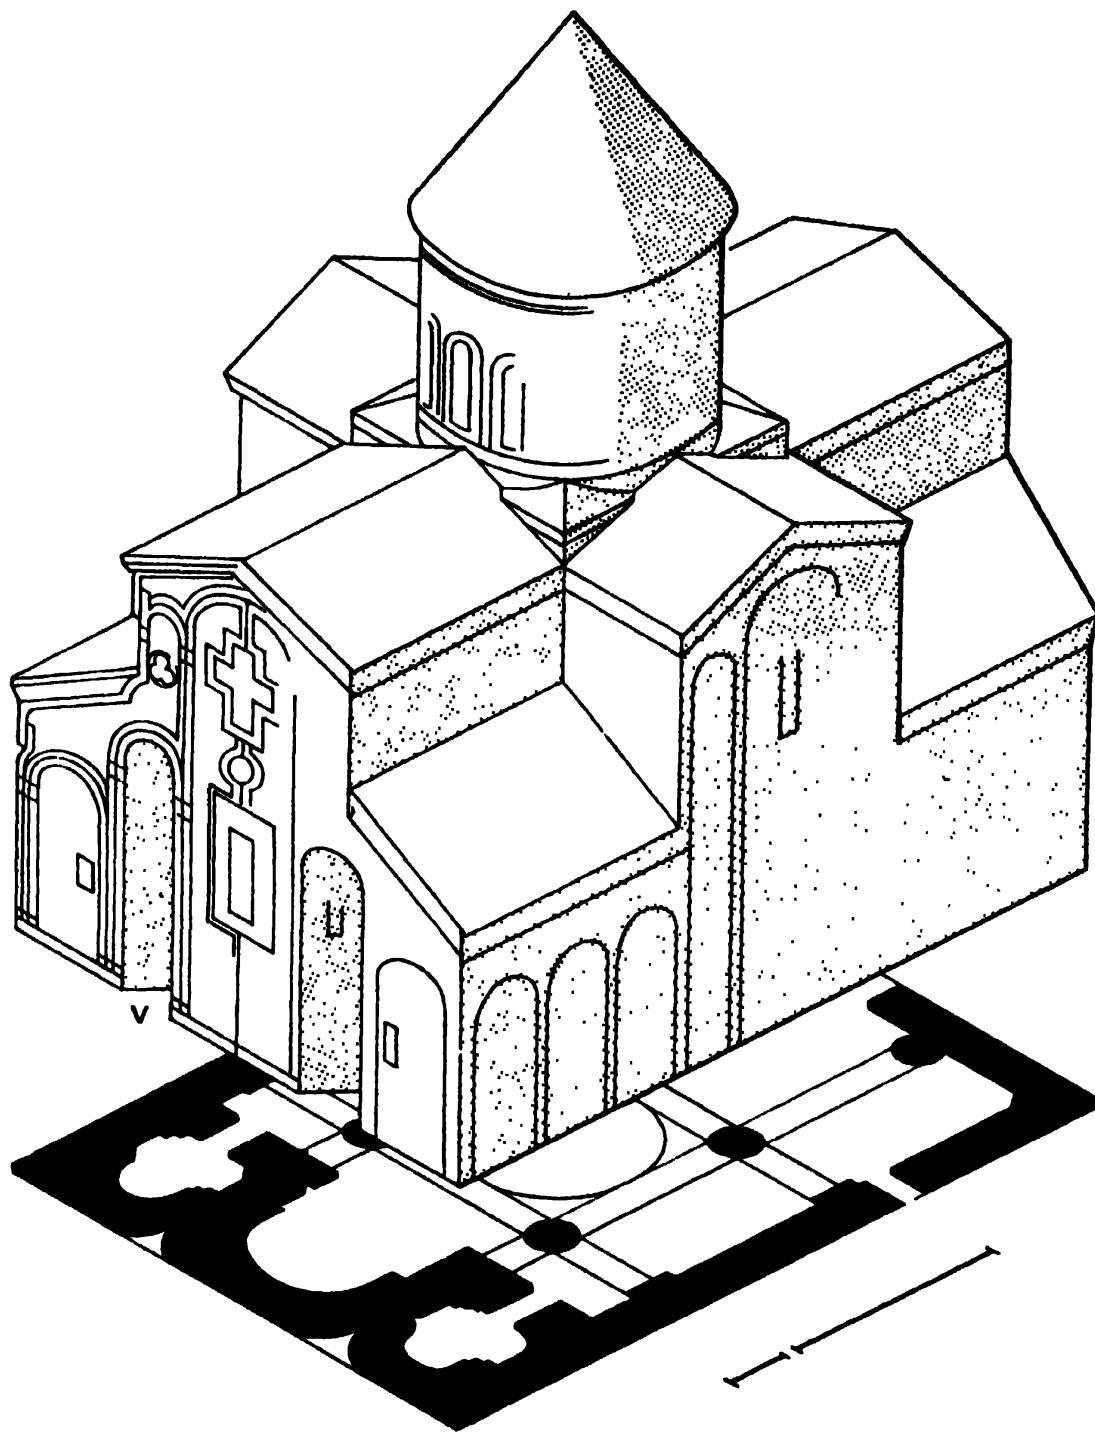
Partial plan and elevation of an Armenian church (after Auguste Choisy).
